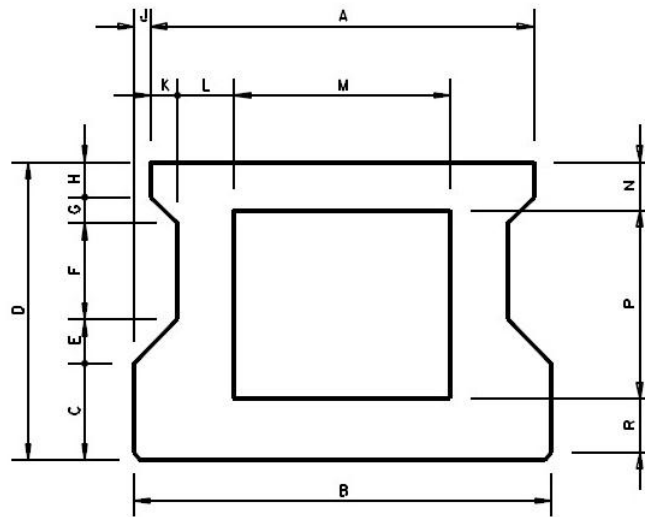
Standard Decked Slab Girder Cross Section Properties and Strand Grid
